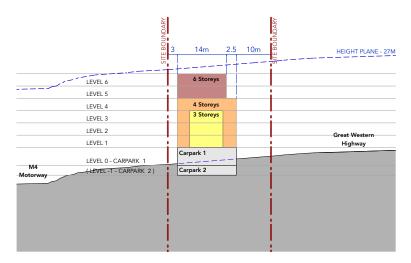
East Schematic Section - Building Envelope & Ground & Upper Setbacks
